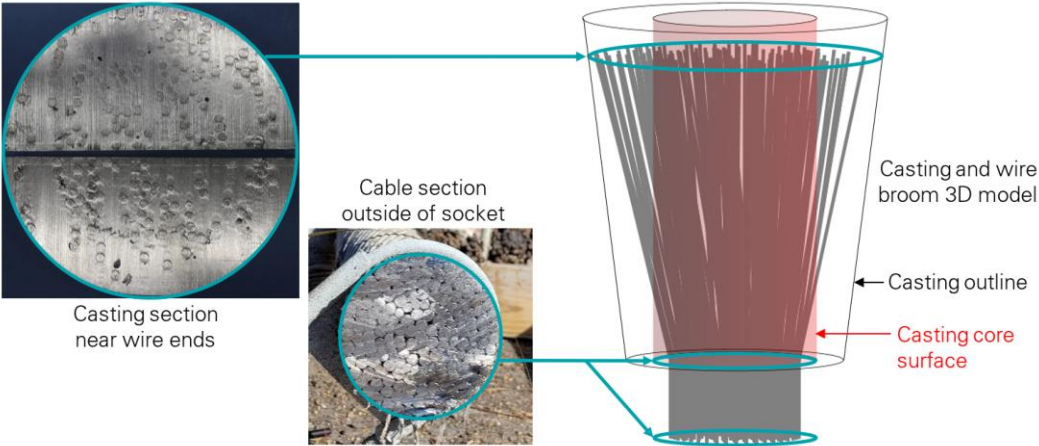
Construction of broom geometry from cable and casting sections (casting section photo: Socotec).
